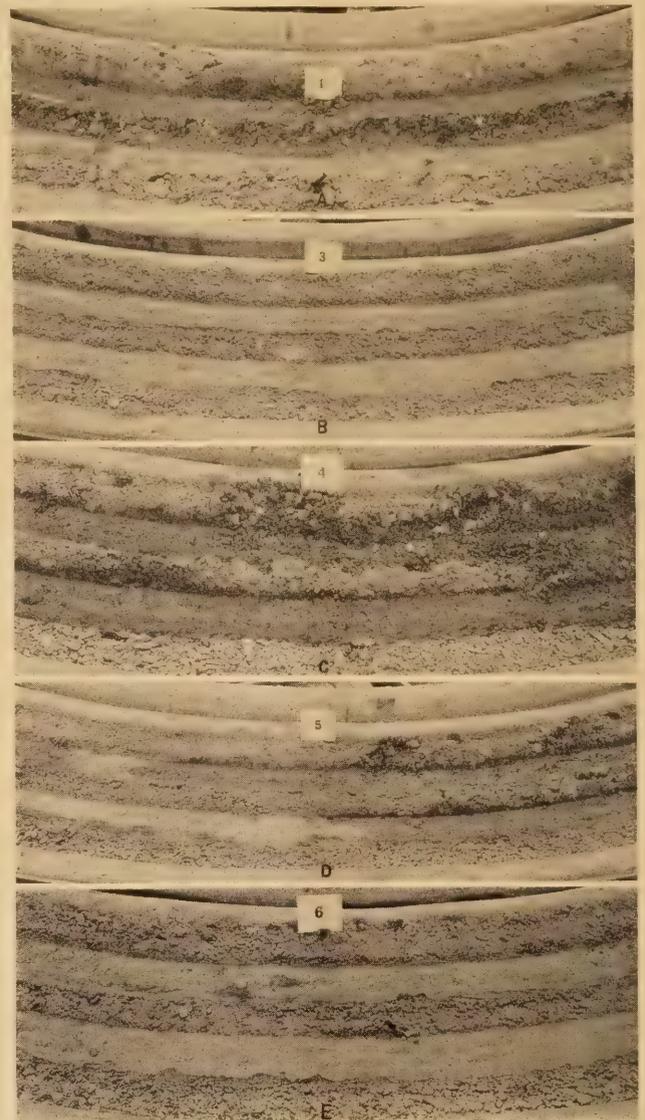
APPEARANCE OF CIRCULAR TRACK TEST SECTIONS AFTER 210,000 WHEEL-TRIPS (END OF TEST). A, SECTION 1 HAD FAILED; SECTION 2 (NOT SHOWN) HAD PREVIOUSLY FAILED; B, SECTION 3 REMAINED IN GOOD CONDITION (COMPARE WITH FIG. 6-C); C, SECTION 4 RUTTED AND SURFACE BROKE, EXPOSING BASE; D, CONSIDERABLE DISPLACEMENT OCCURRED ON SECTION 5 (COMPARE WITH FIG. 6-E); E, SECTION 6 REMAINED IN GOOD CONDITION (COMPARE WITH FIG. 6-F).
